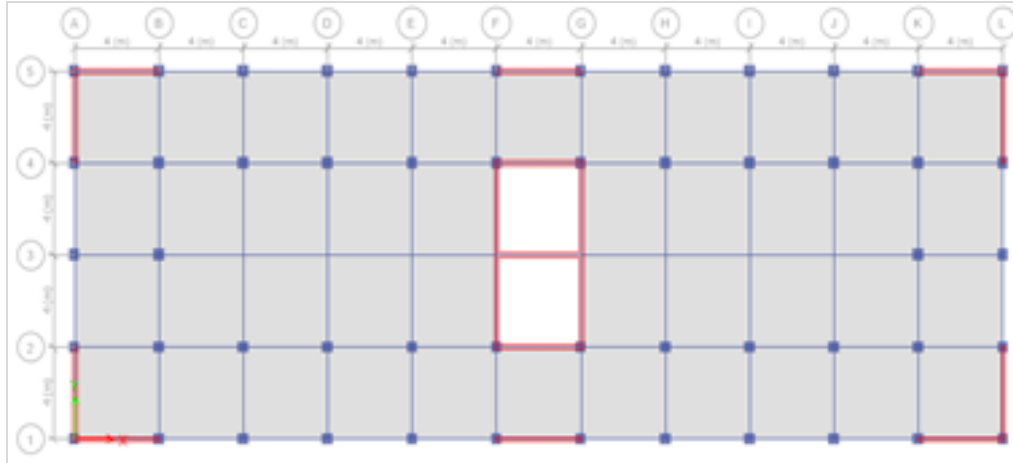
Layout of Tube in tube structure with shear wall at core, corners and side
